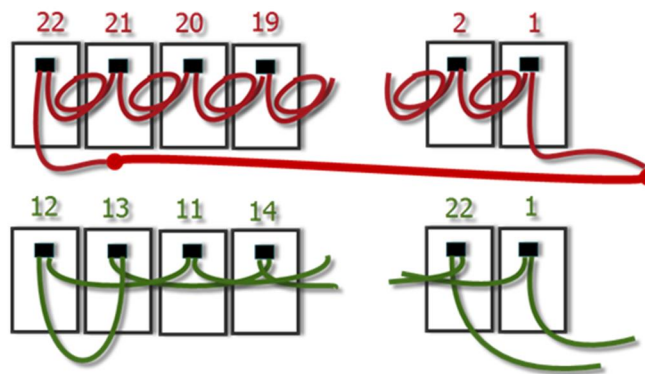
Schema for string cabling to avoid long back cables (own sketch)
